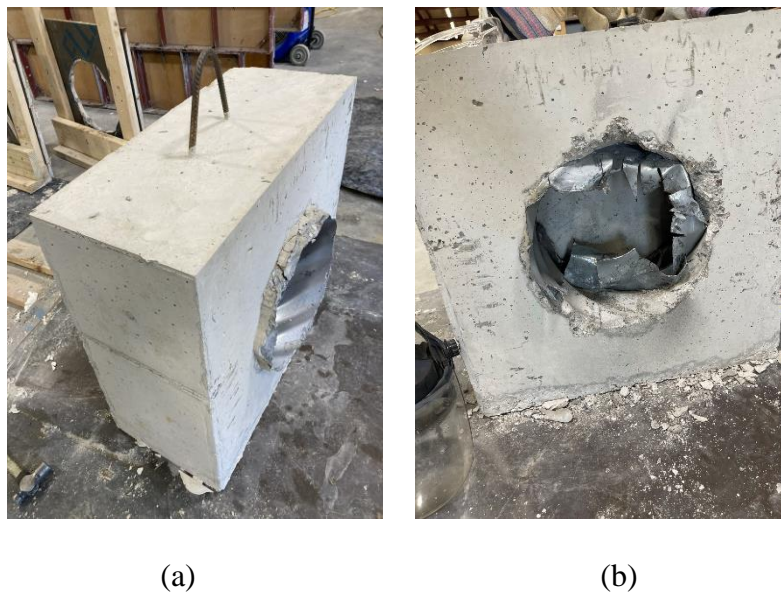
Attempt to remove the CSP from trial specimen 1 showing (a) a portion of the CSP extending from the footing and (b) damage to the CSP and socket caused by attempts to remove the CSP
